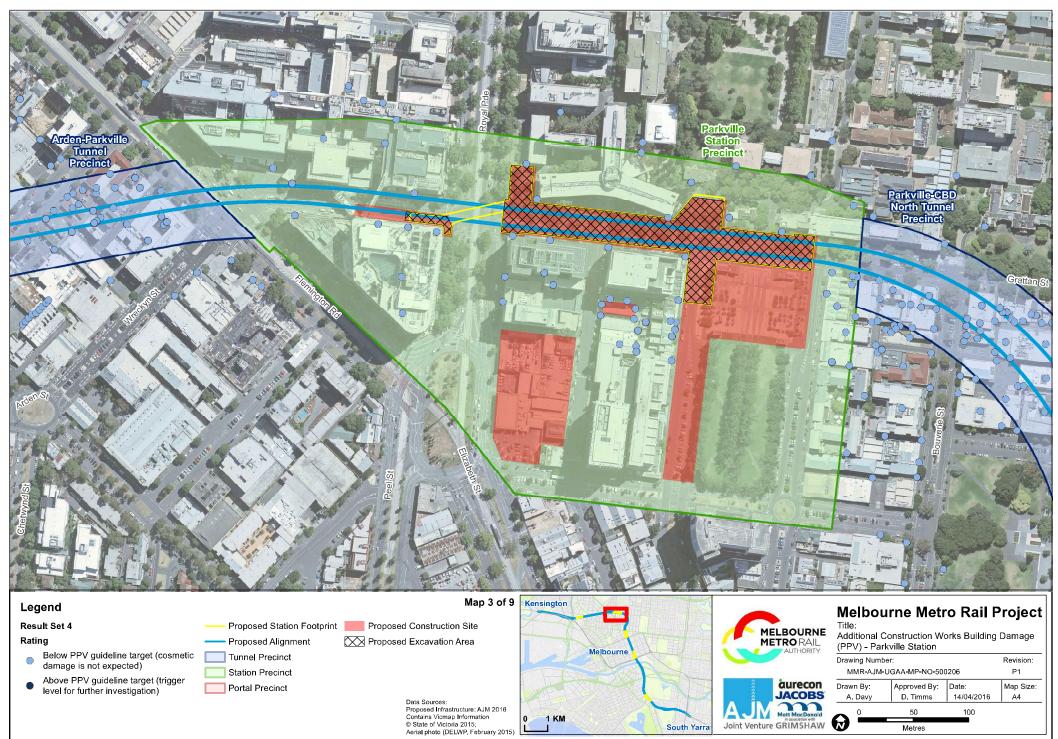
Colour coded building damage assessment due to Additional Construction Works – Parkville Station Precinct
